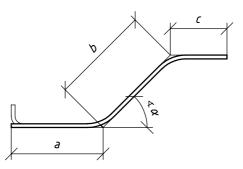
Bending dimensions — Shape code 99 (non-standard example)
